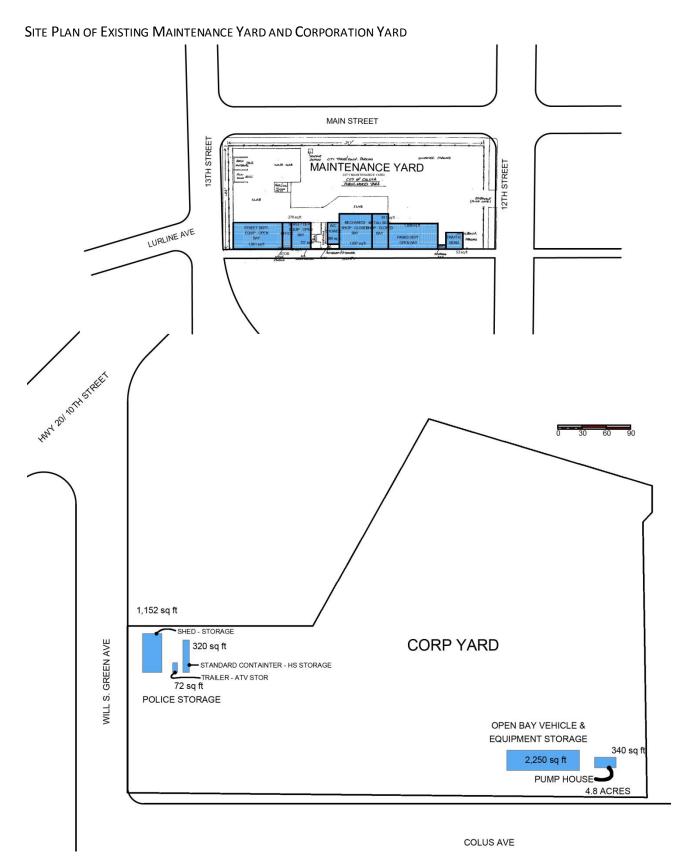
Site Plan of Existing Maintenance Yard and Corporation Yard
